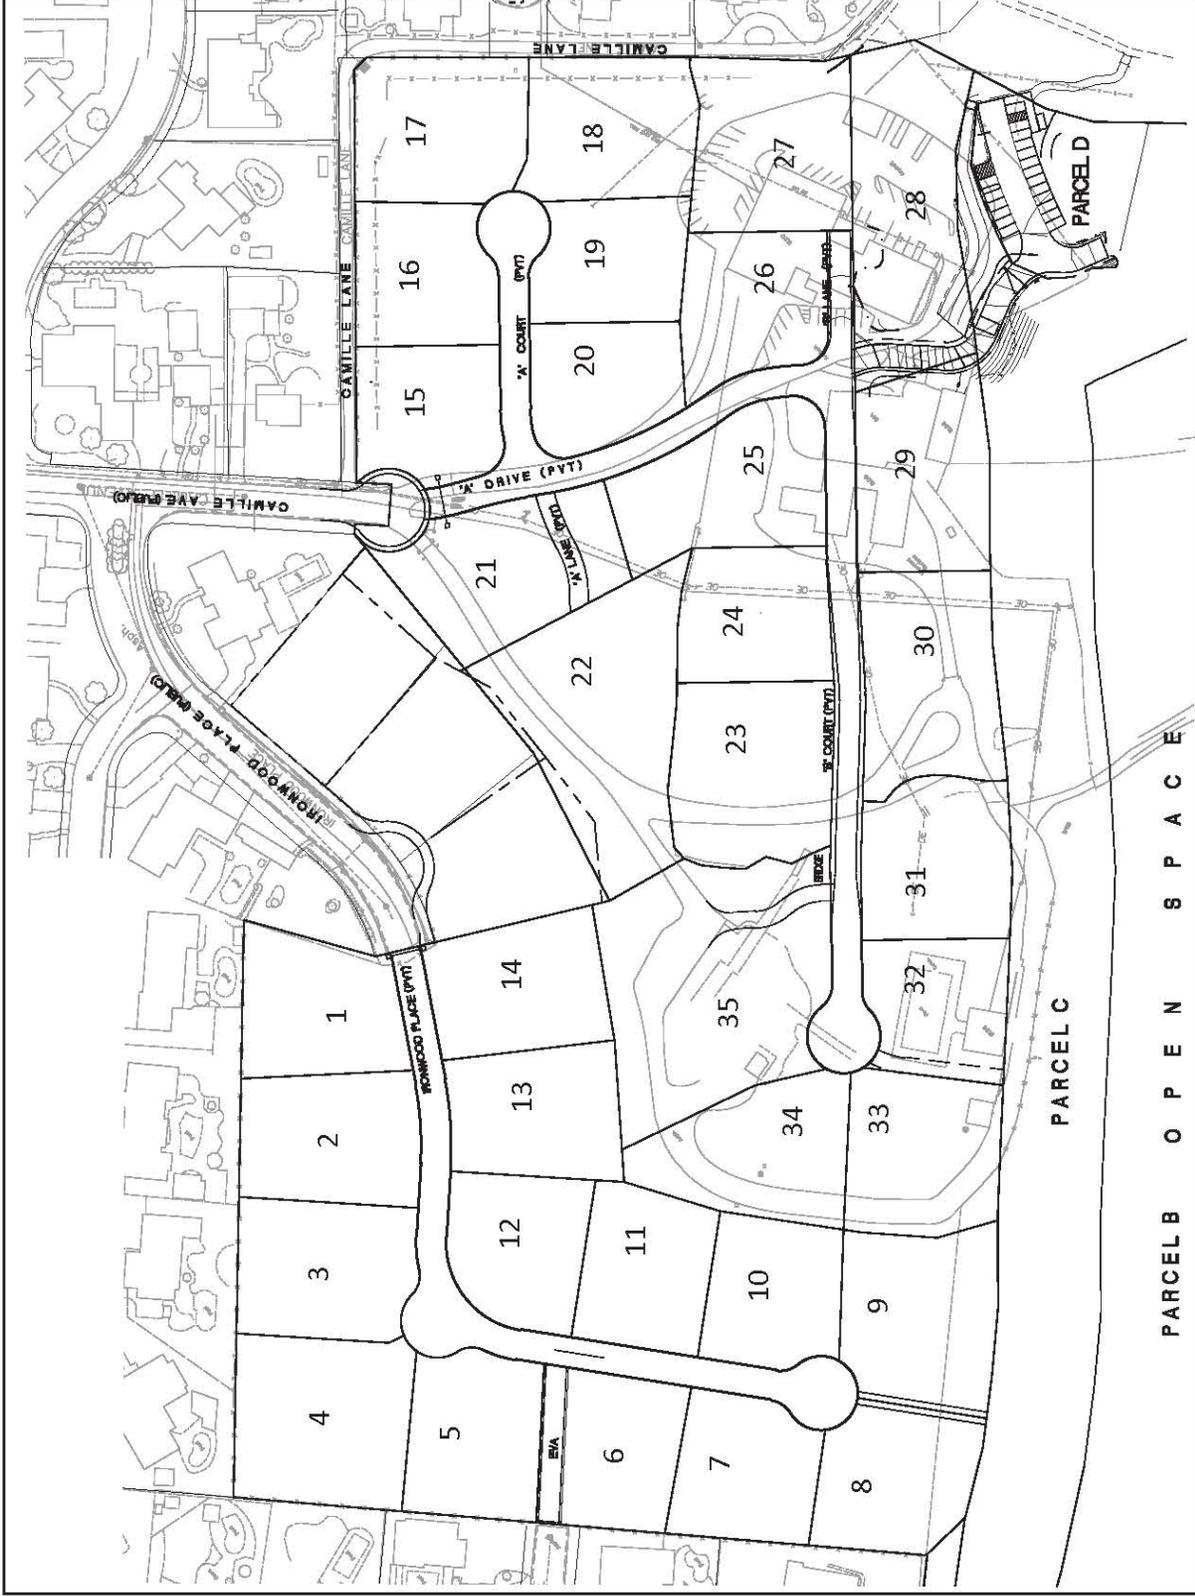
Ball Estates Site Plan - Parcel D Staging Area
